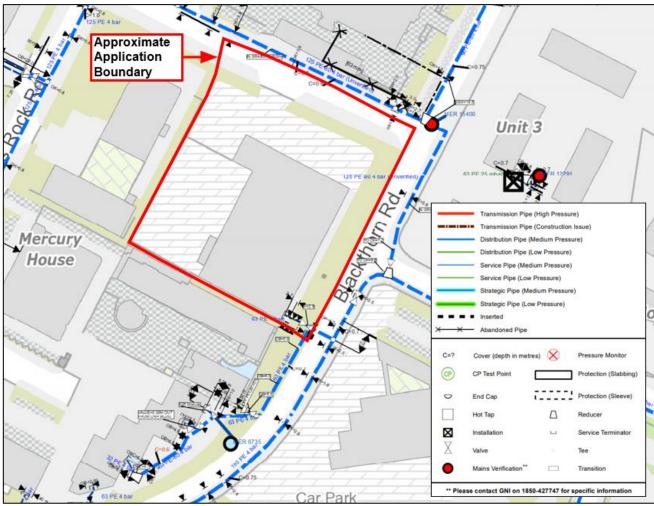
GNI Service Layout surrounding the Carmanhall Road SHD.
